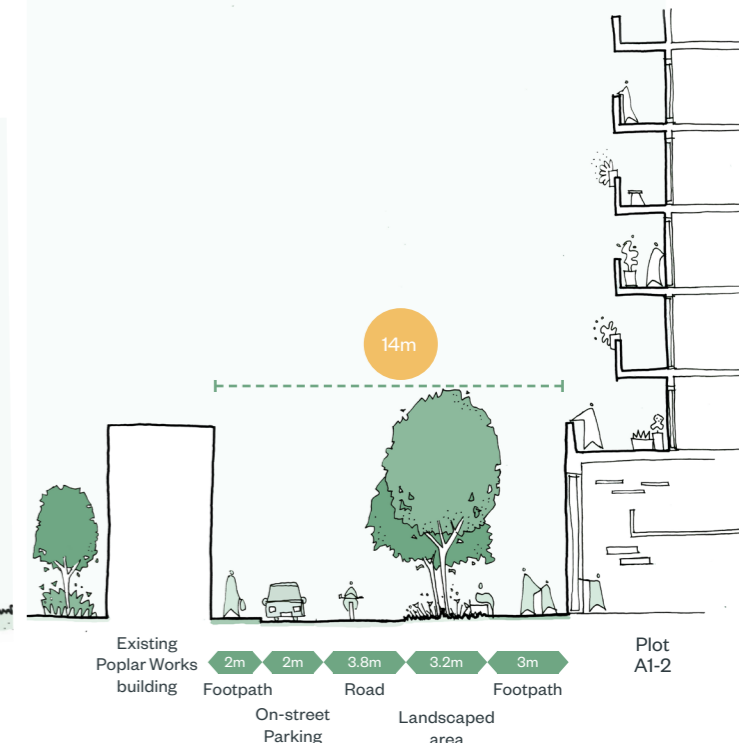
Illustrative street section BB - secondary street (Enterprise Yard)
